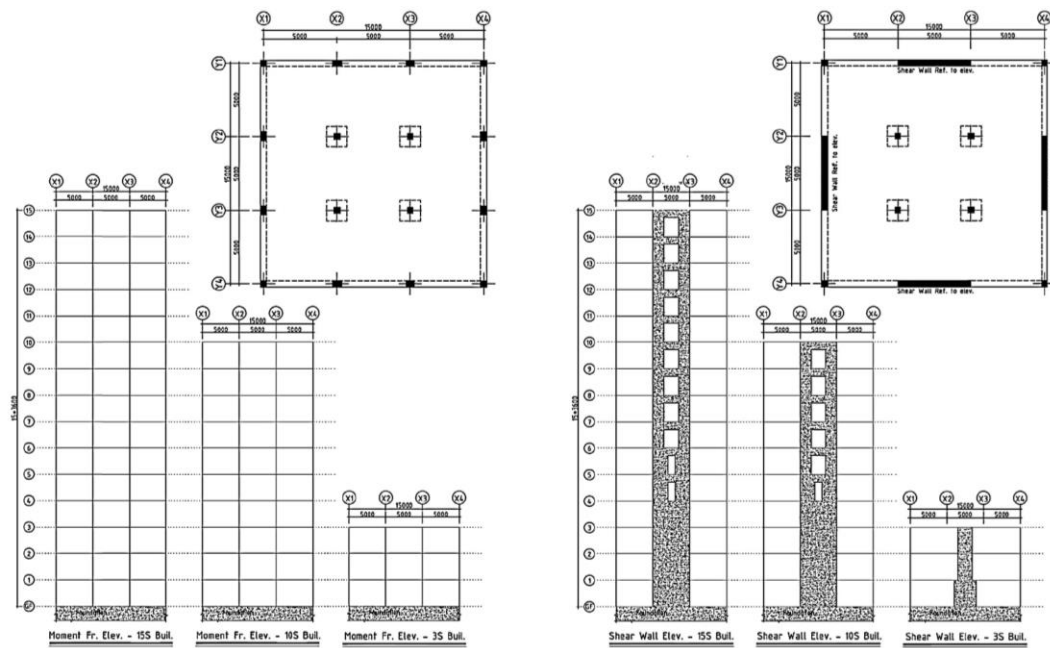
Concrete Moment Resisting Frame (Left) and Shear Wall (Right) Structure Models
